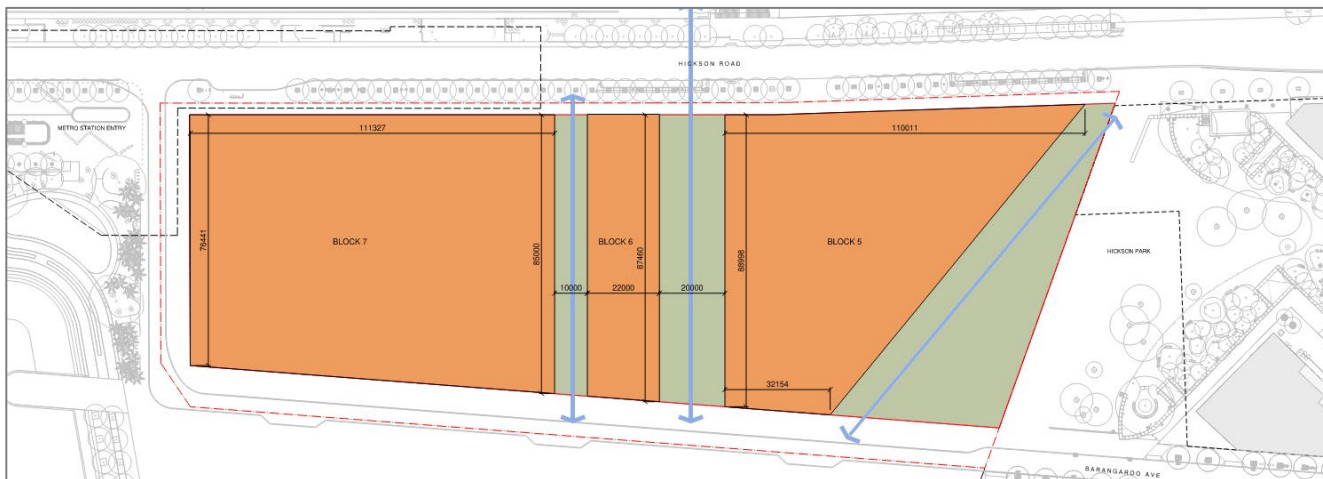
APPROVED CONCEPT PLAN (SJB)
